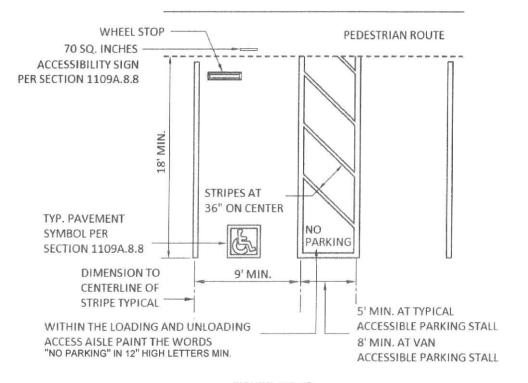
A-2B SINGLE AND VAN ACCESSIBLE PARKING STALLS
